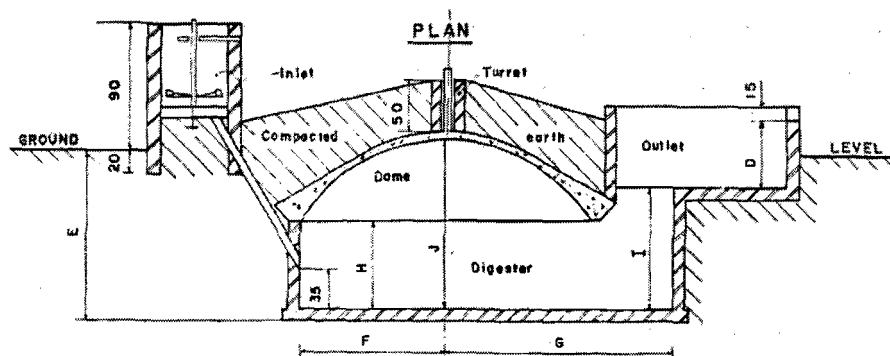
Cross section of a GGC 2047 biogas plant [69]
